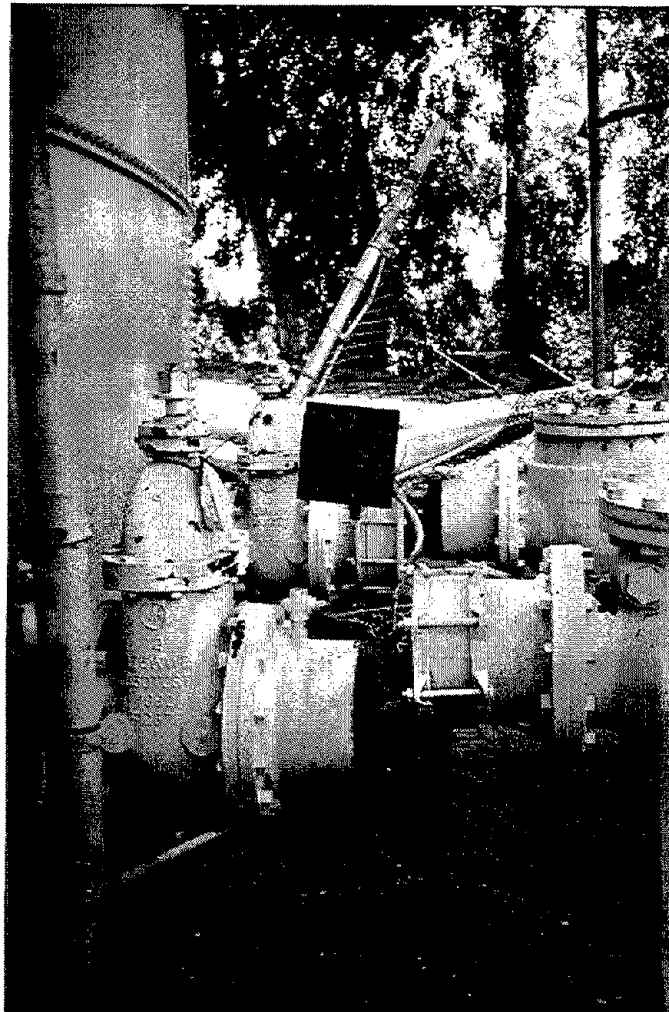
Dresser coupling failed at the tank inlet and outlet. (A. Gibson)
